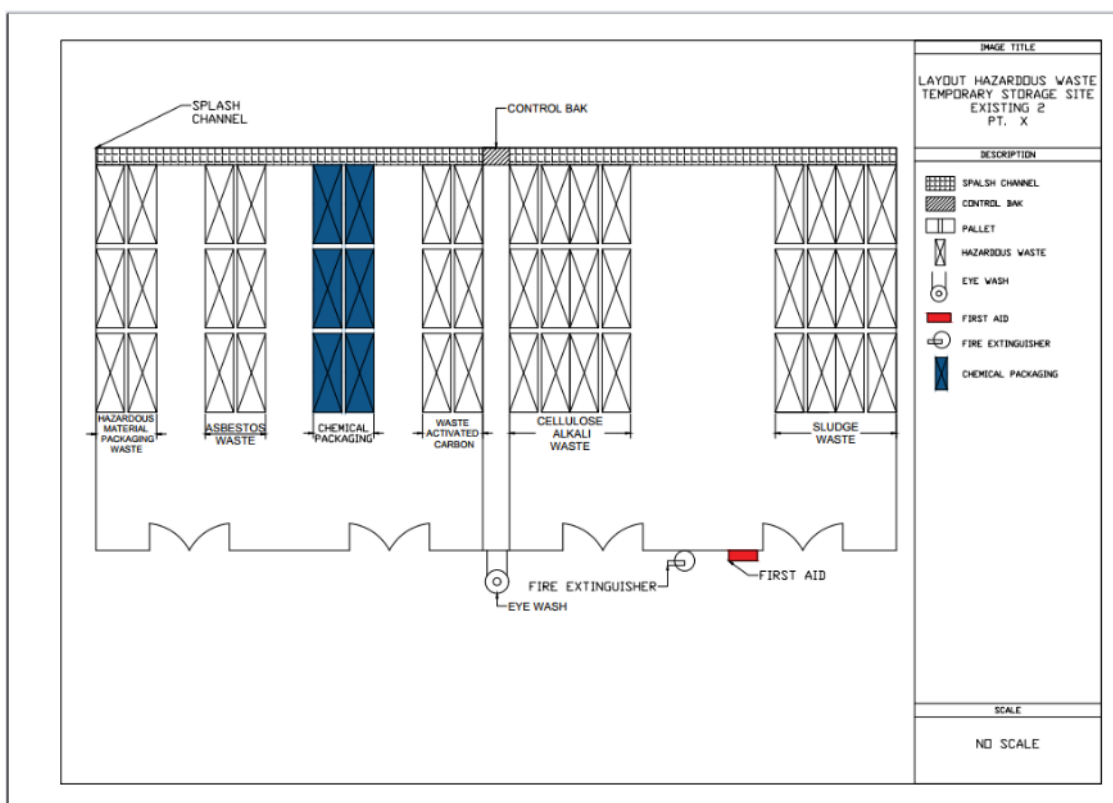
Layout of the Second Hazardous Waste Temporary Storage Site at PT. X
